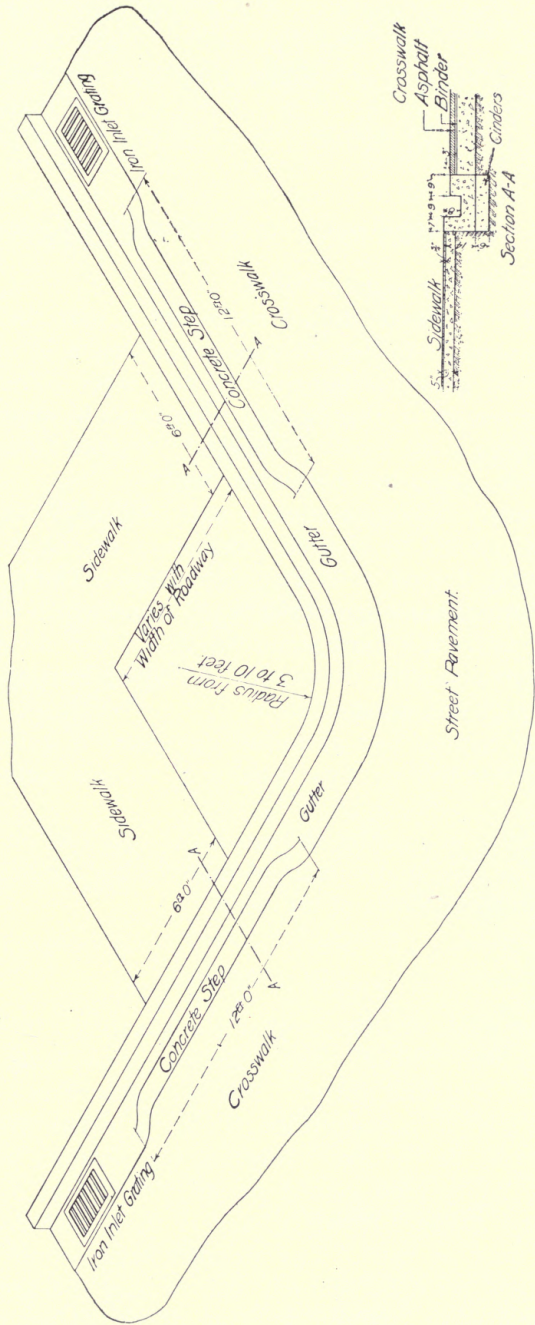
CONCRETE CURB, AND GUTTER, AND CROSS-WALK CONSTRUCTION.
